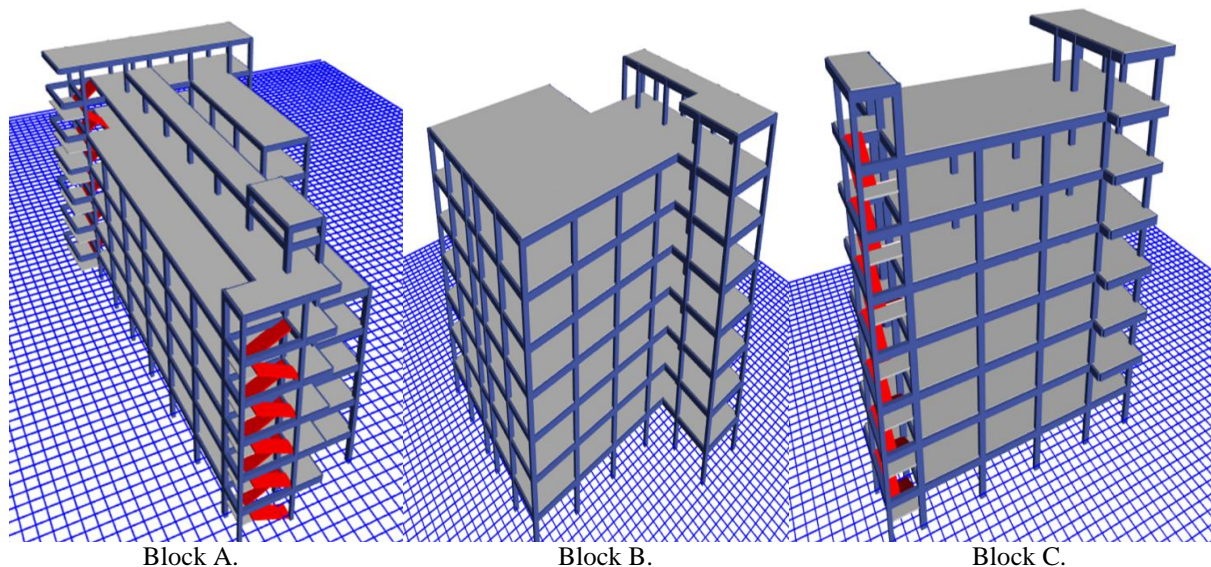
Structural 3-D Modelling of Existing building without Shear wall
